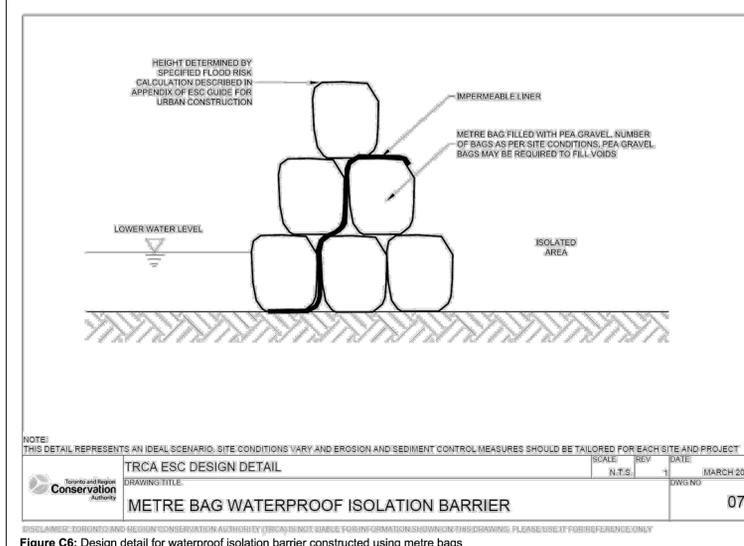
Design detail for waterproof isolation barrier constructed using metre bags
